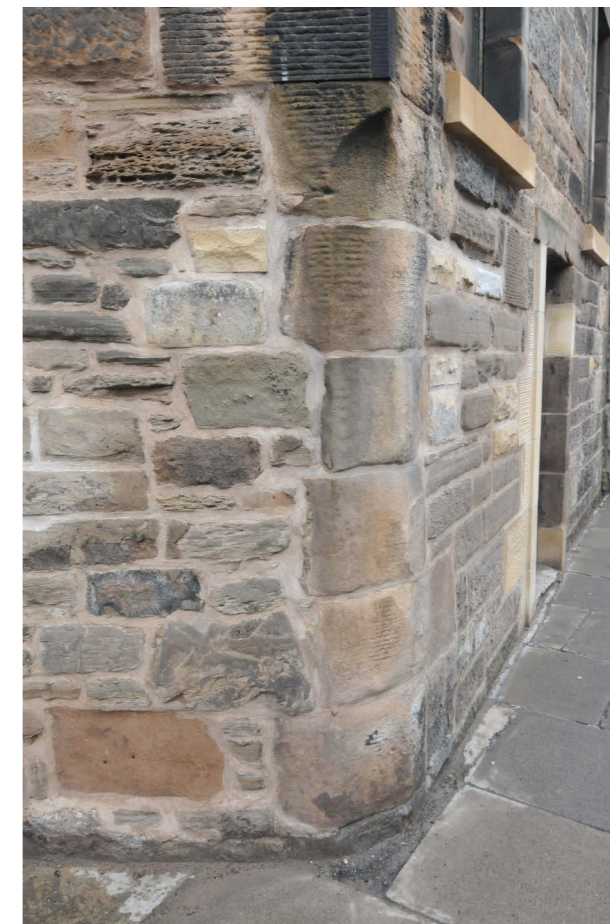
Exterior, detail of chamfered quoins at south corner of the east-facing elevation
